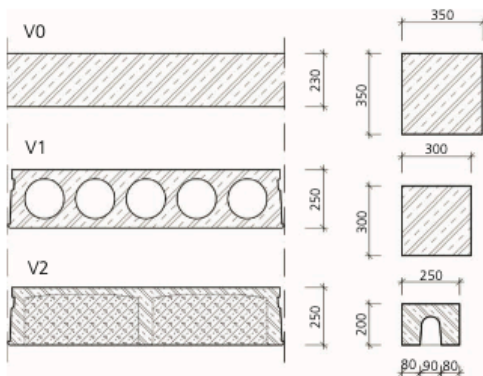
Designed structures in the variants of CS2. Left: typical vertical cross-sections of floor structures. Right: typical horizontal cross-sections of columns (dimensions in mm)
